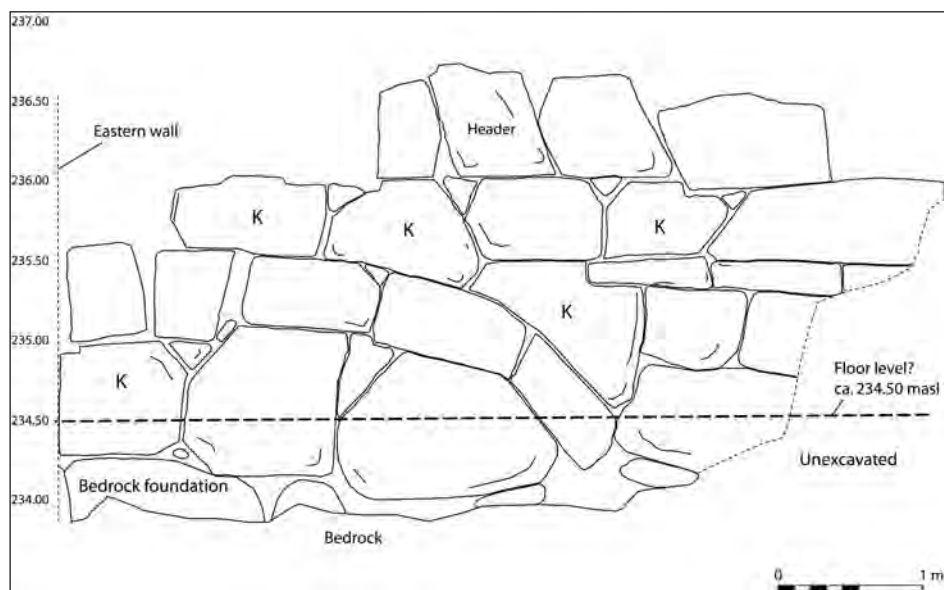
South wall, south-facing elevation with the assumed original floor level at 234.50 masl. Note the frequency of triangular plugs and keyed blocks (K).
